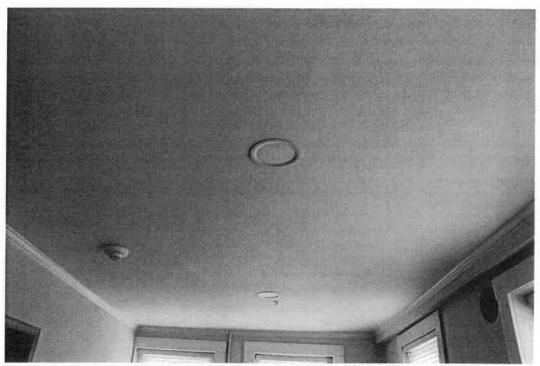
Sheet rock ceiling in second floor southernmost unit
